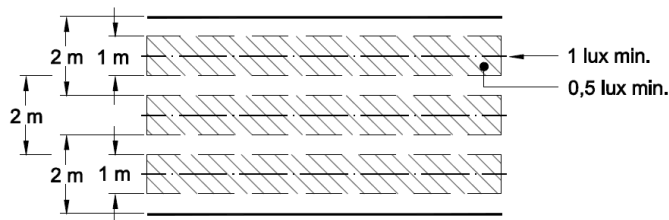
5 m wide defined escape route treated as three 2 m wide overlapping strips
